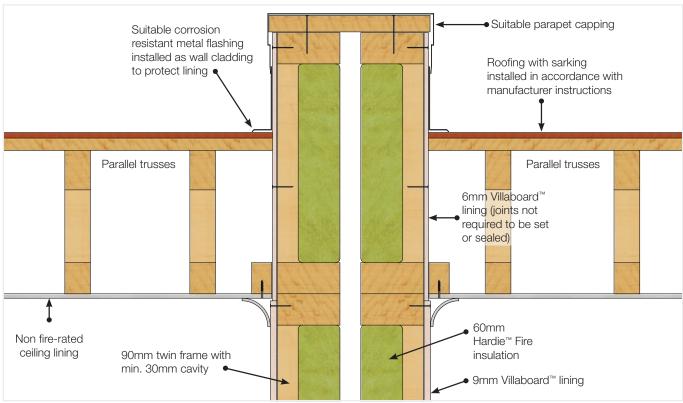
HARDIE™ SMART INTERTENANCY WALL SYSTEM WITH PARAPET ROOF JUNCTION
